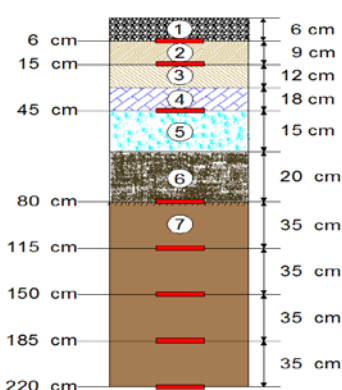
Scheme for location of sensors in pavement structure and subgrade for section with asphalt concrete pavement of “Astana-Burabai” highway: 1..6 – numbers of pavement layers; 7 – subgrade; ■ – temperature and moisture sensors
